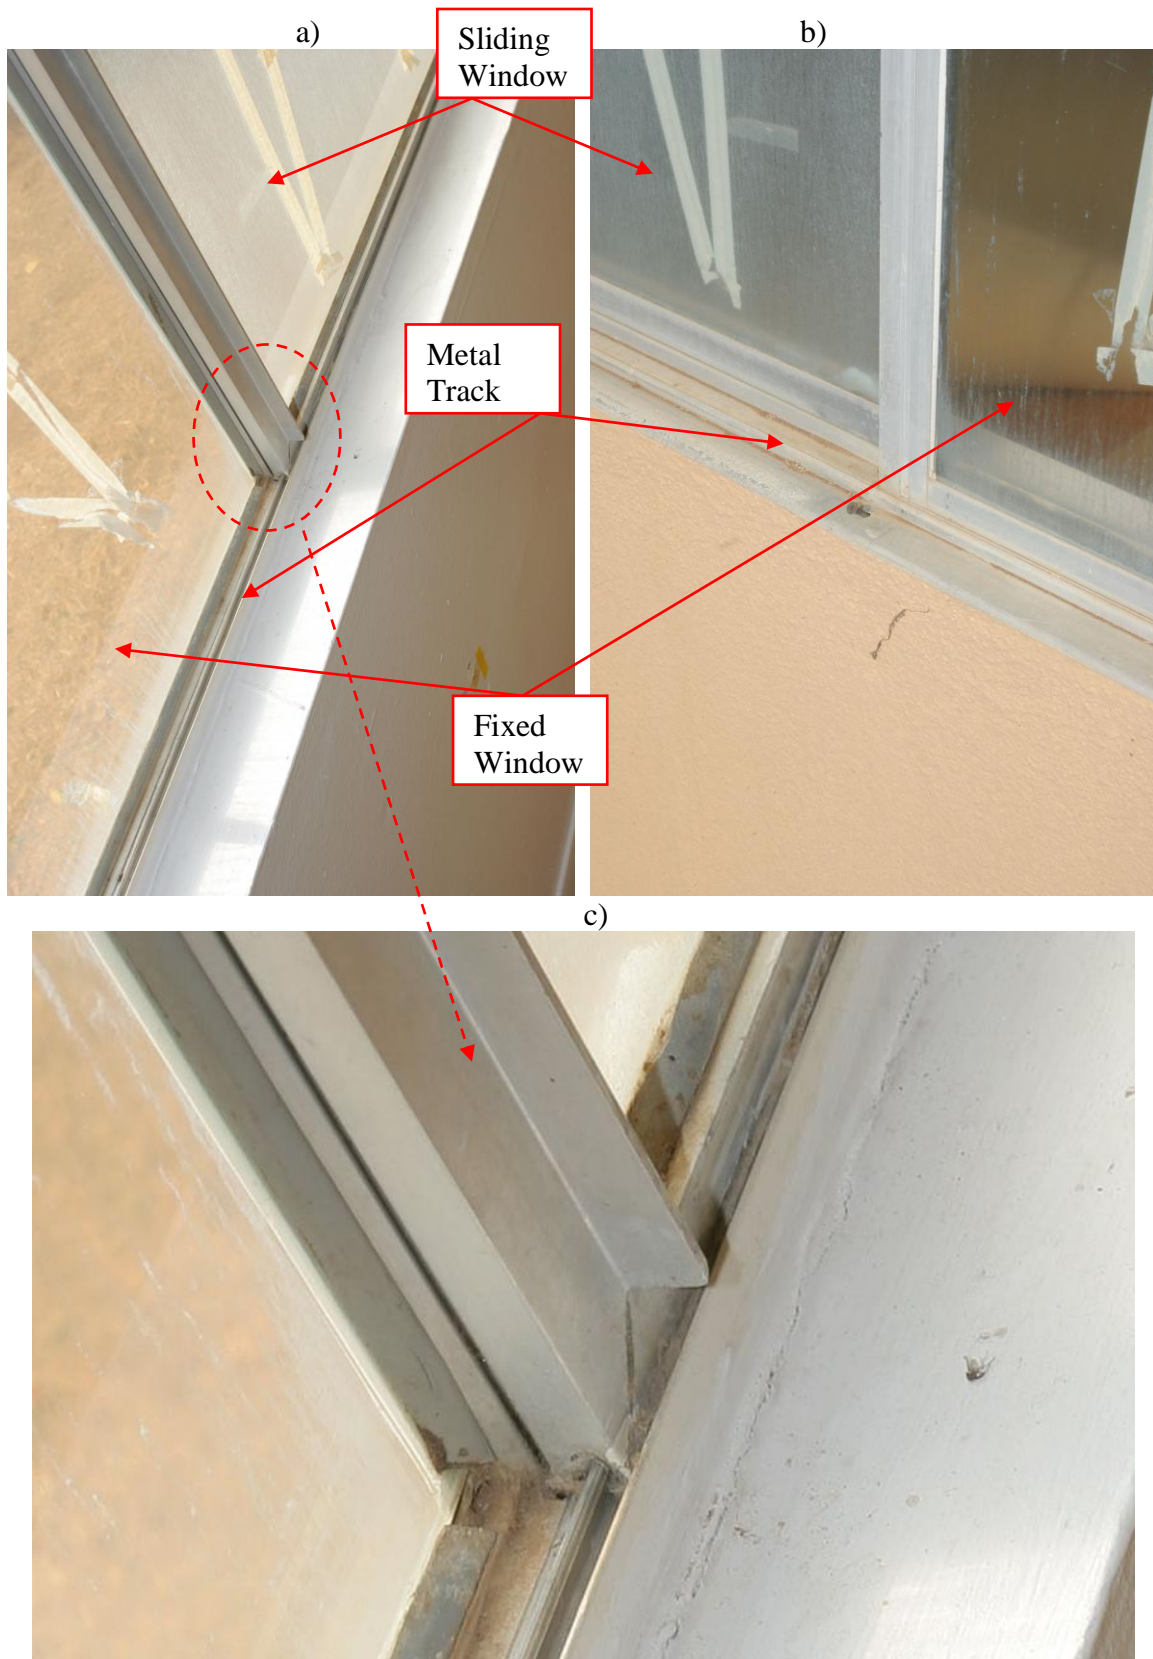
The 4-foot by 6-foot window a) looking at the window from inside the house, b) looking at the window from outside the house, c) detail of the track and frames.
